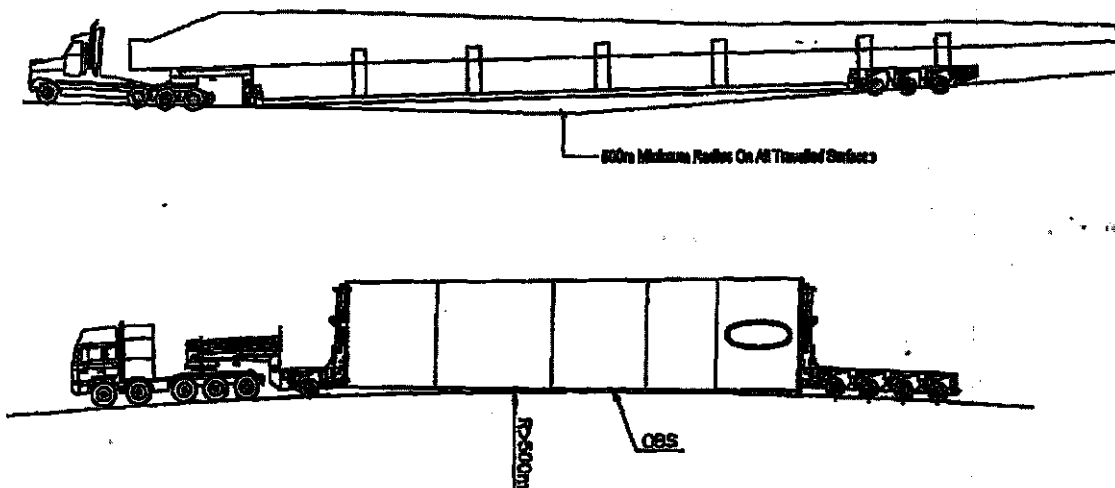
Roof profile. The effective running width,  $B$  must be a minimum of 5m (16 ft) exclusive of shoulders on straight sections of the road.
